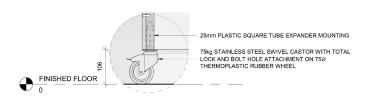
Discovery wall reading nook detail (Author, 2020)
